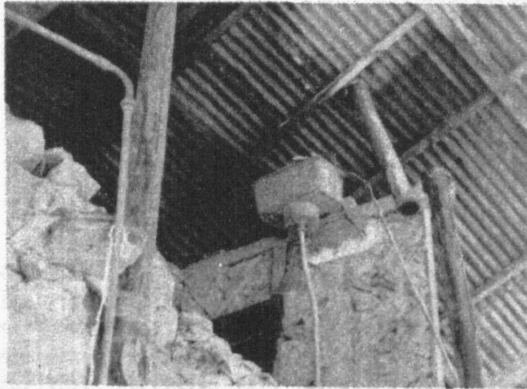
COLLAPSE OF GABLE END WALL IN A HOUSE AT LEO - AN INTERIOR WALL REINFORCED BY TIMBER HAVING X - BRACING DID NOT COLLAPSE
